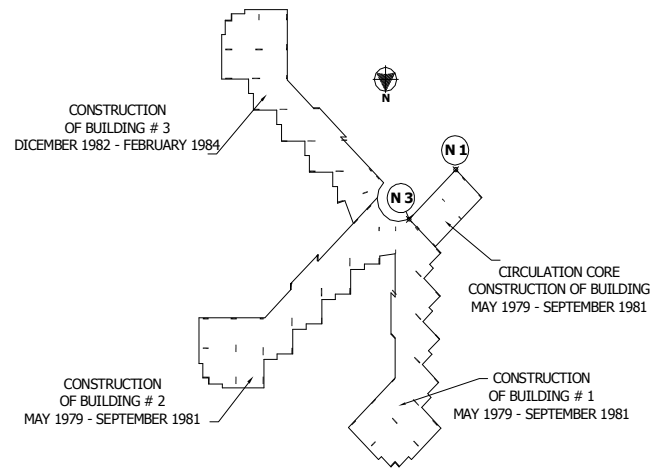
Plan Drawing and Locations of settlements, points N3 and N1
